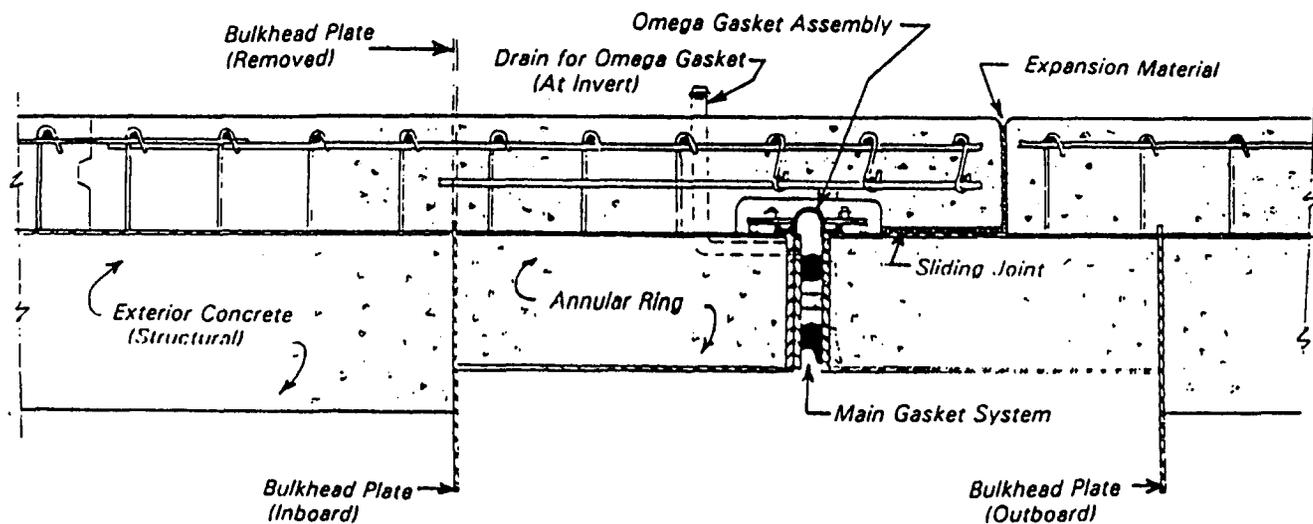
Typical joint detail for Boston's Ted Williams Tunnel.
